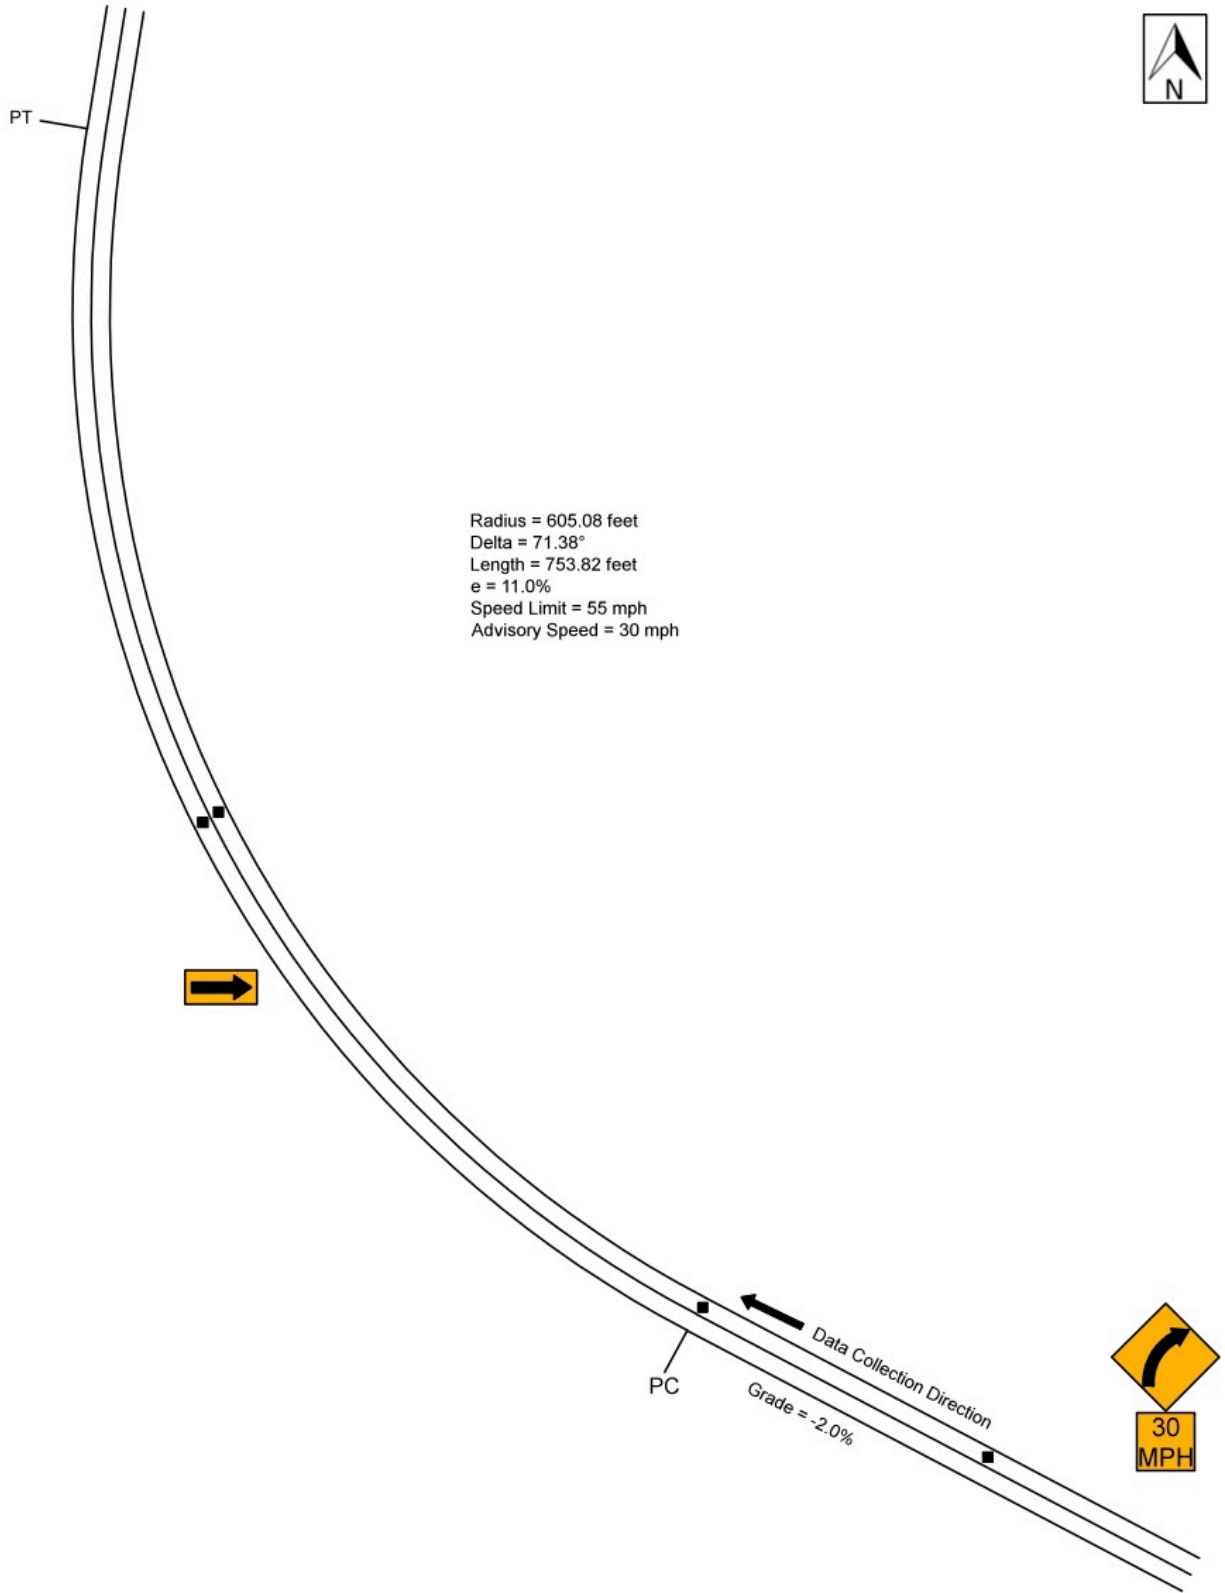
Diagram. Geometric layout of the U.S. Route 219 treatment A site (not to scale).
